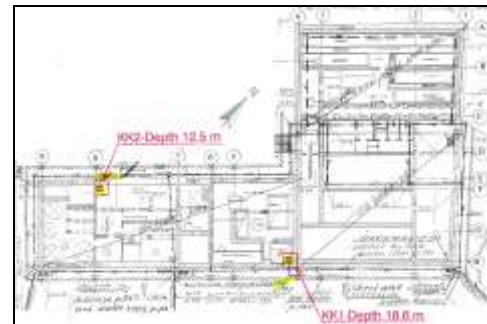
Foundation wall plan with test pits KK 1, KK 2, water supply pipes, drains, perimeter sheet-pile fencing and clay depths (KAREG internal archives)
